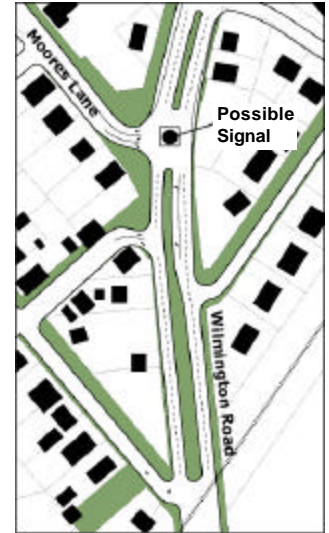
Proposed Wilmington Road and Moores Lane intersection
